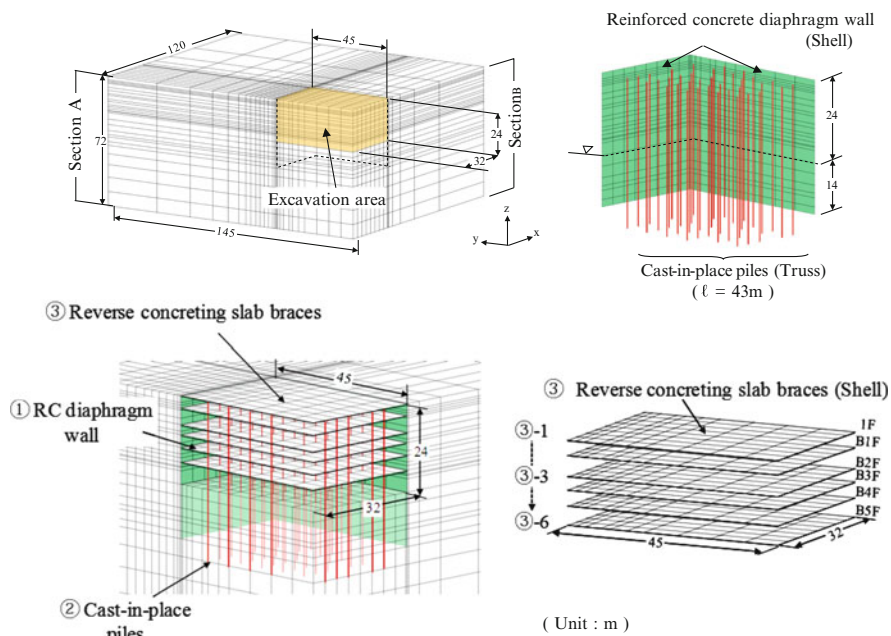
Finite element modeling of the construction sequence (construction sequence: ①–③)
